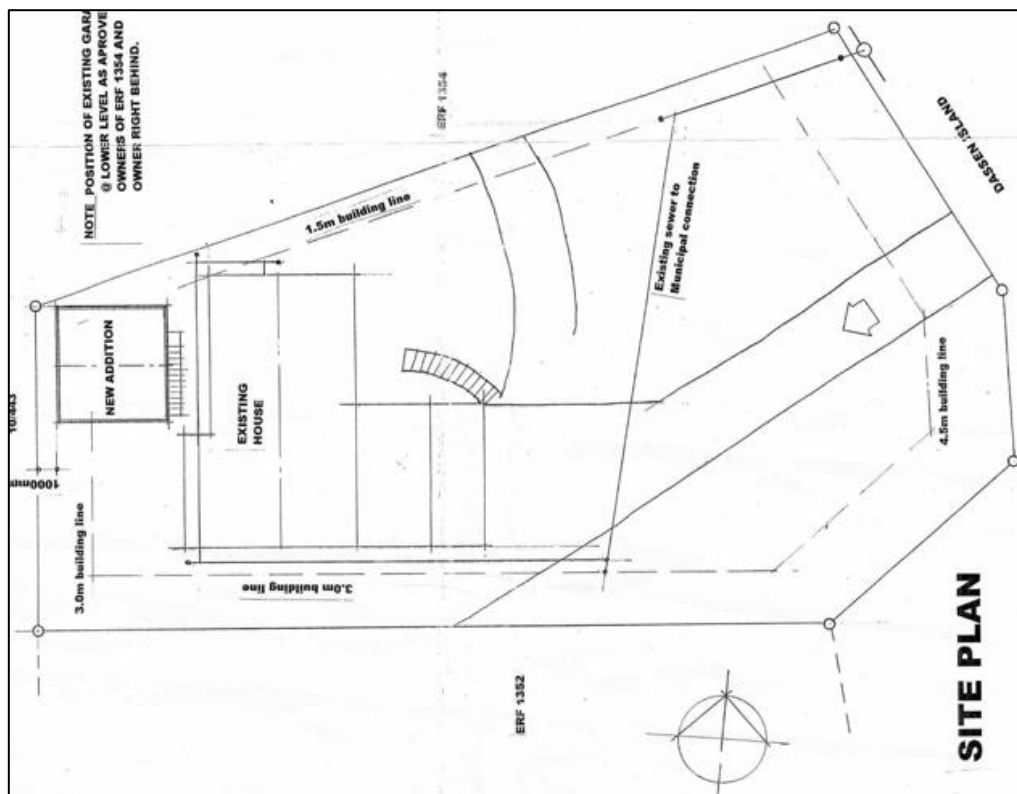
EXTRACT PREVIOUSLY APPROVED BUILDING PLANS
